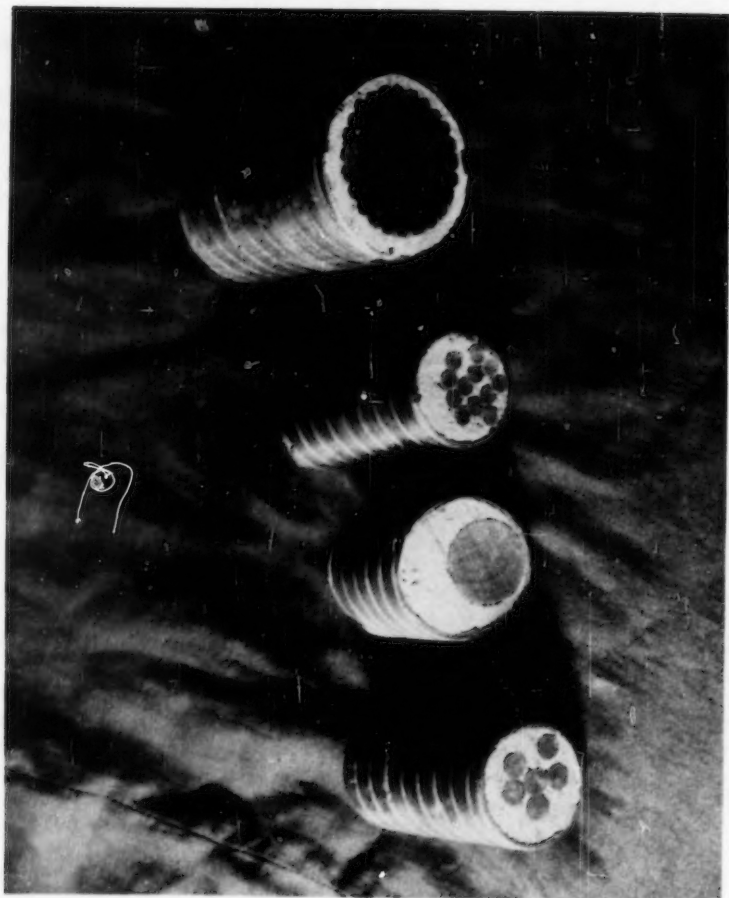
Sections cut from Prestressing Elements on Newbury-Newburyport Project.
